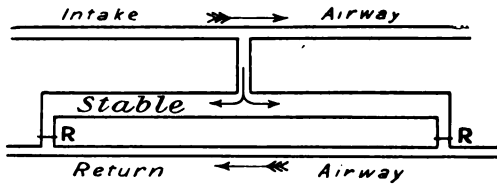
Plan showing Position of Stables in respect of Intake and Return Airways.
